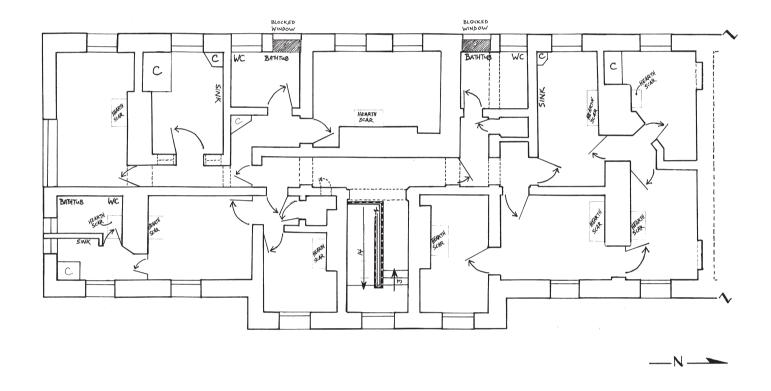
Drawn plan of 4th floor (top floor) of Block X
